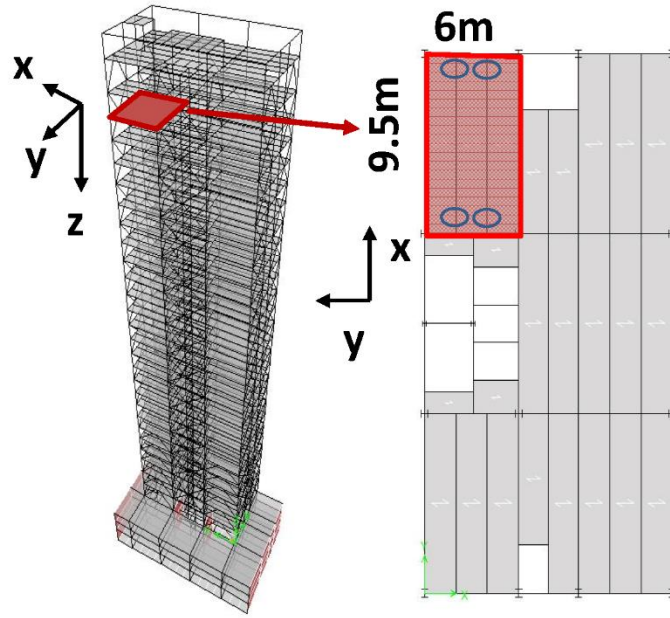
Case study: (a) 28-story tall steel building and (b) the compartment floor layout.
